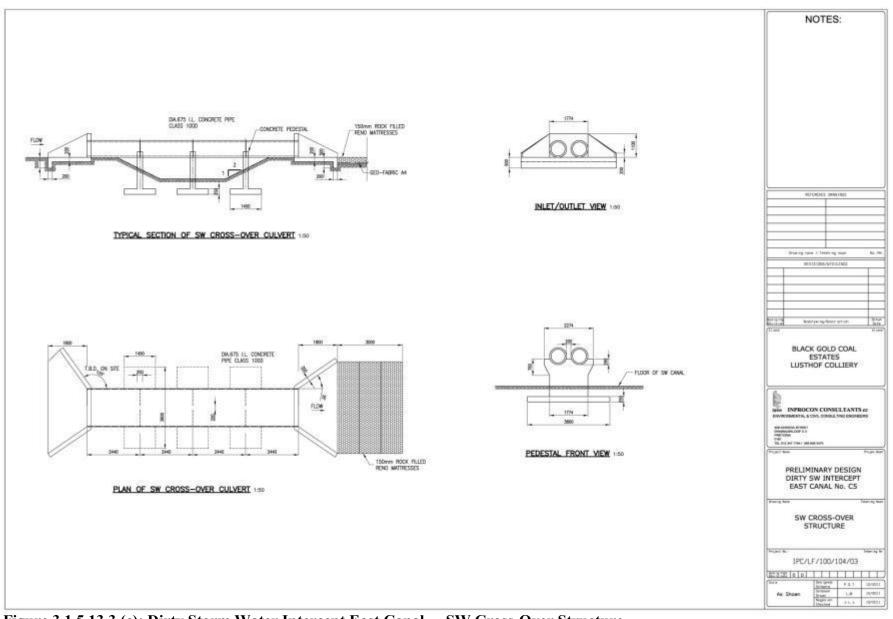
(c): Dirty Storm Water Intercept East Canal - SW Cross-Over Structure.
